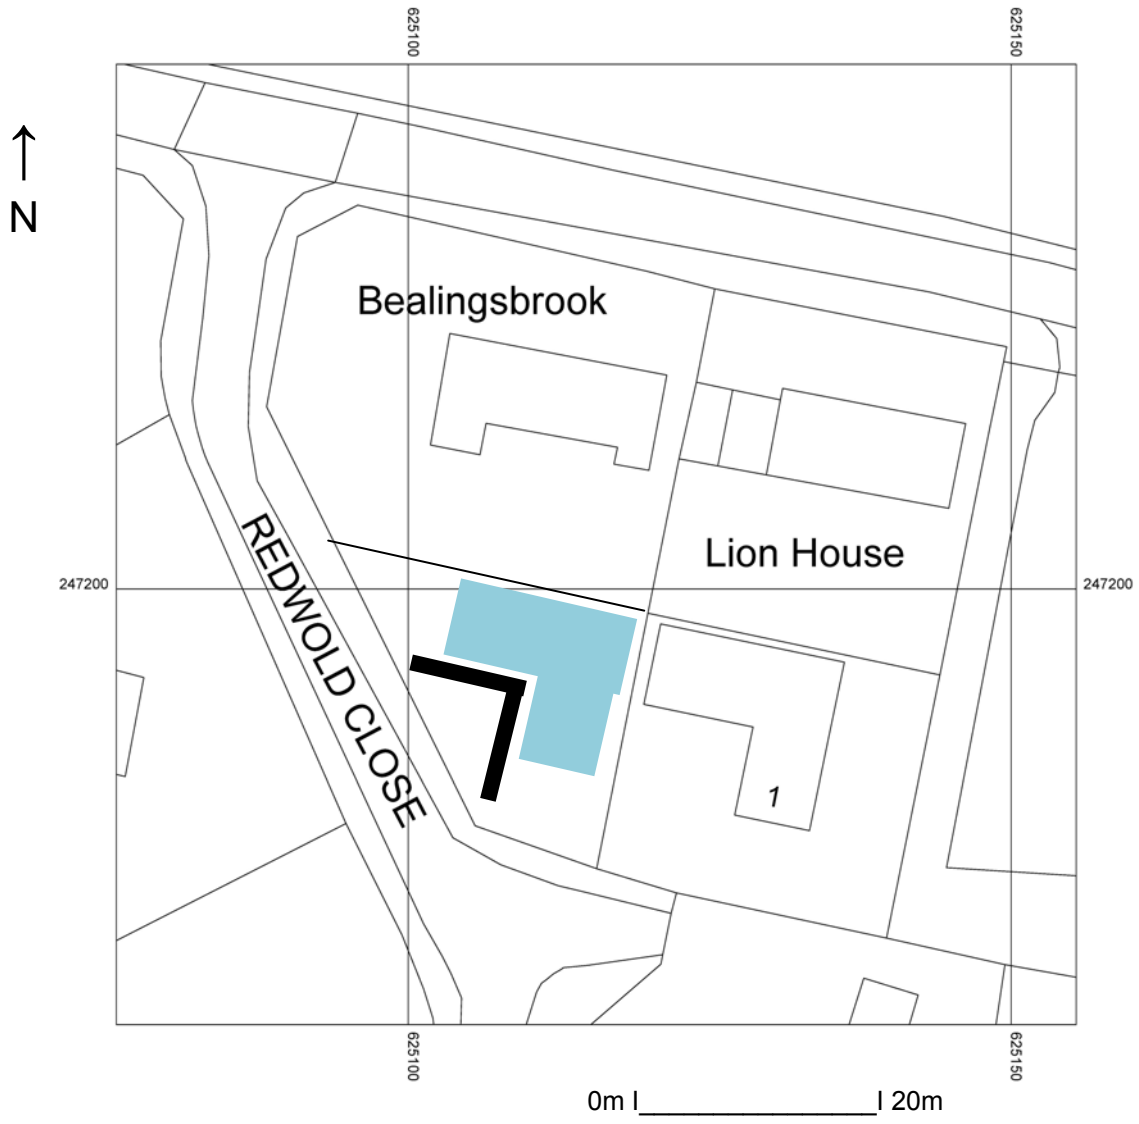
Location of evaluation trench (light blue- planned dwelling footprint)
